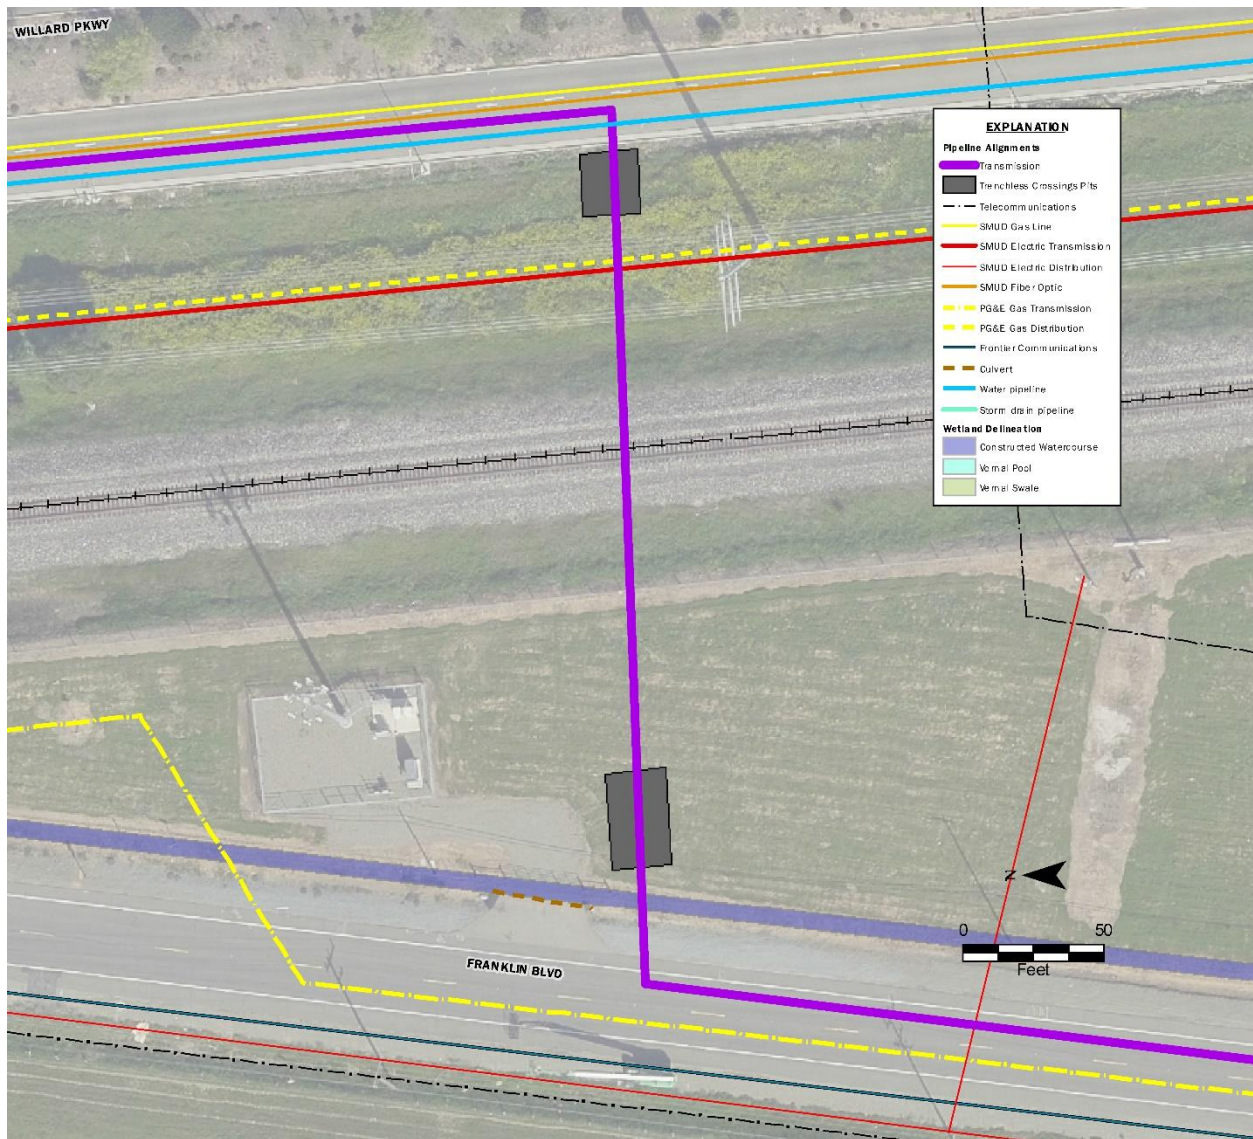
Proposed Trenchless Crossing of UPRR at Franklin Boulevard
